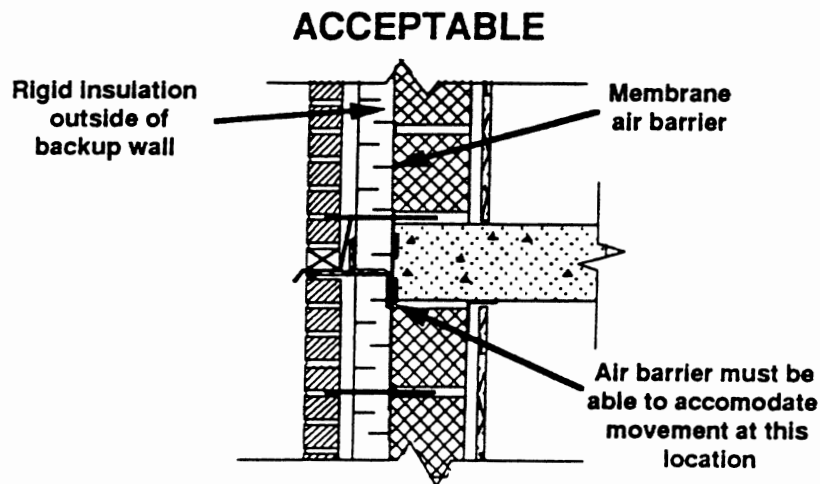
Wall/Floor Connection - Concrete Frame (Brand)
